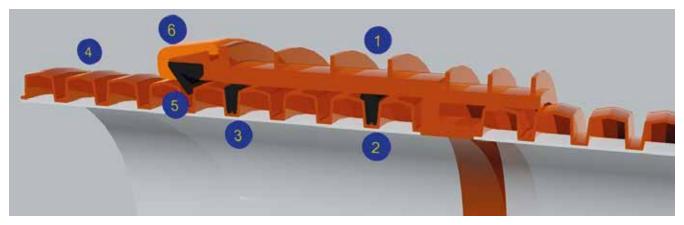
Pragma Lock spigot-and-socket joint locking system - detailed view
